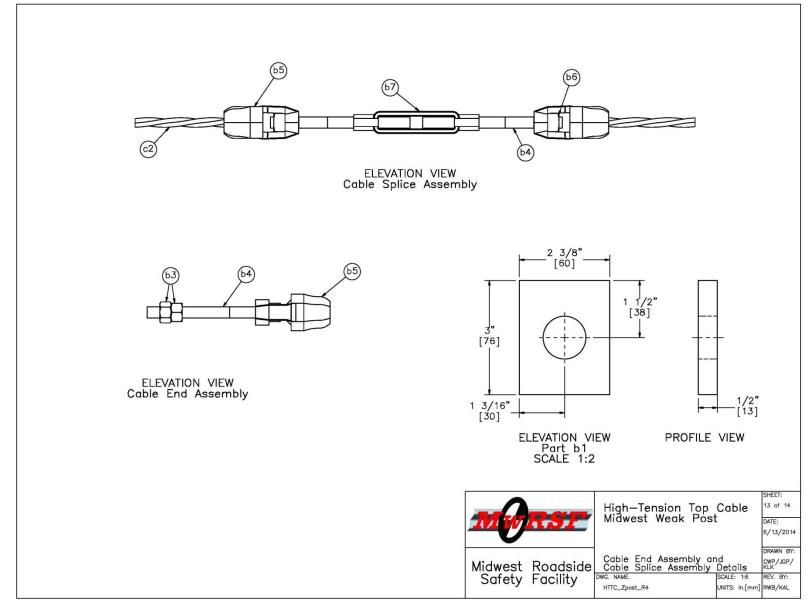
Cable End Assembly and Cable Splice Assembly Details, Test No. HTTC-2
